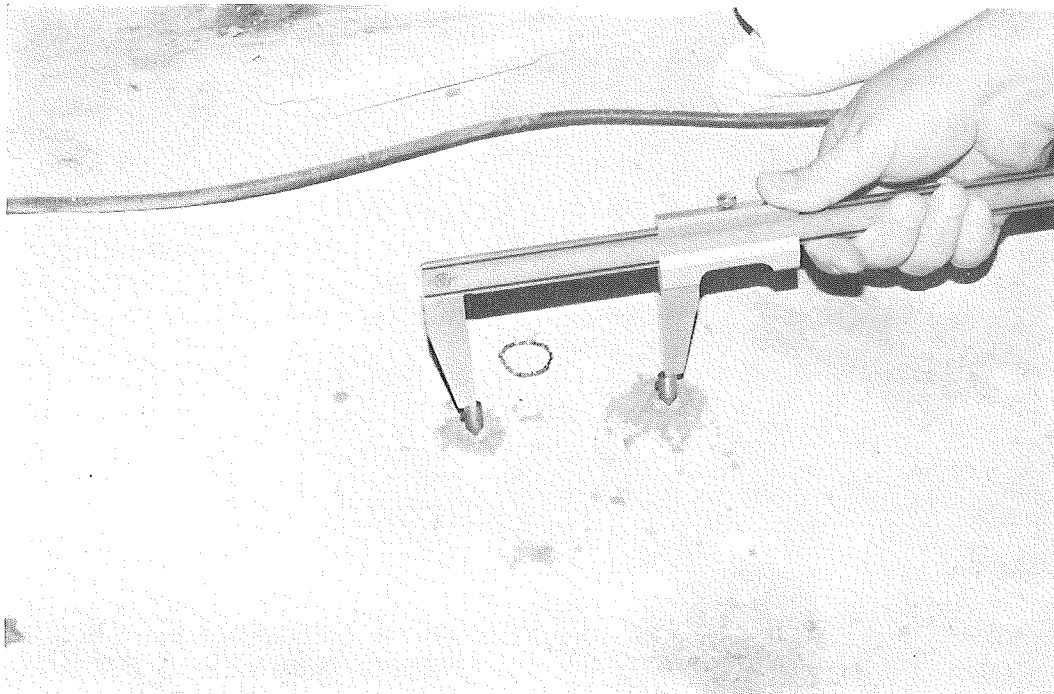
Measuring segment crack widths with a caliper.
